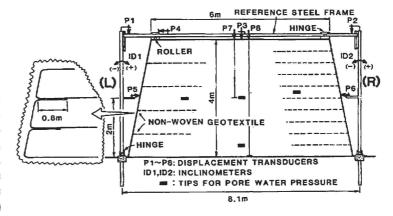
Initial cross-section of Chiba test embankment No. 1.
